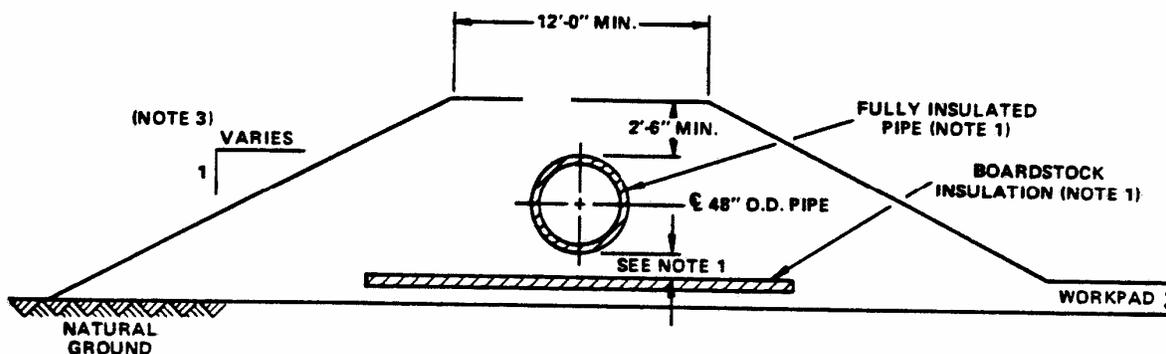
Type III Buried Pipe with Over Excavation and/or Insulation
